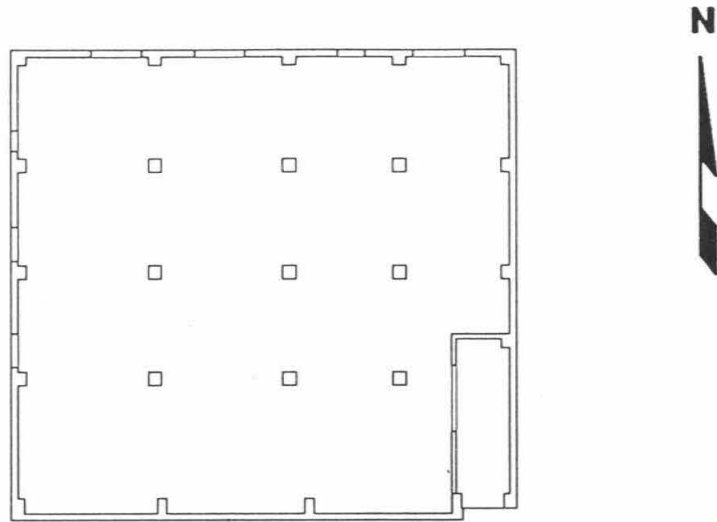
Plan View of Fourth Floor, Elevation 50'-10"
